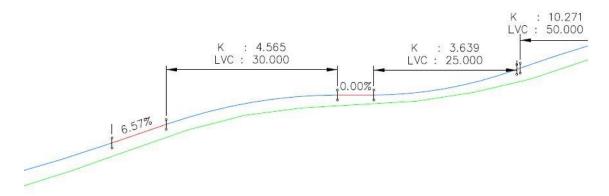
Vertical profile of corrugated pavement section (45+250 km)
